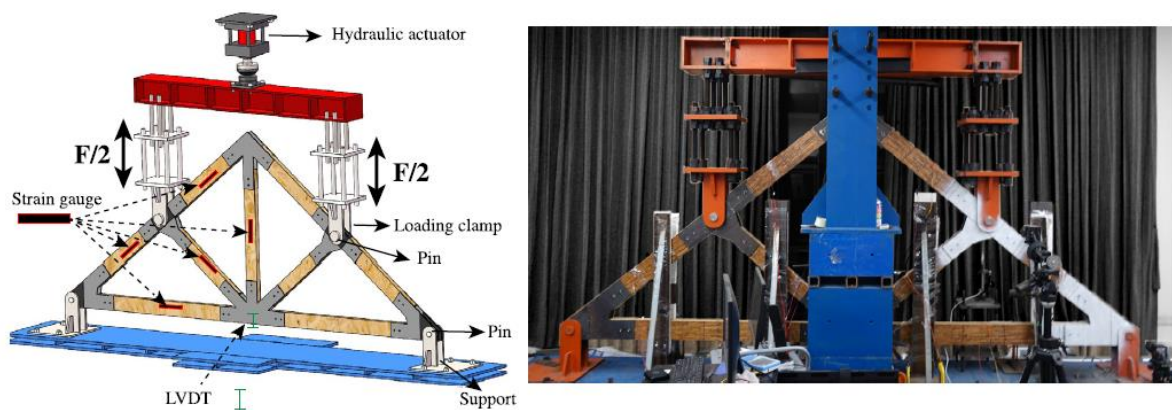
Schematic and On-site View of the Loading Setup for the Steel Side-Clamped-Plate Glubam Roof Truss
